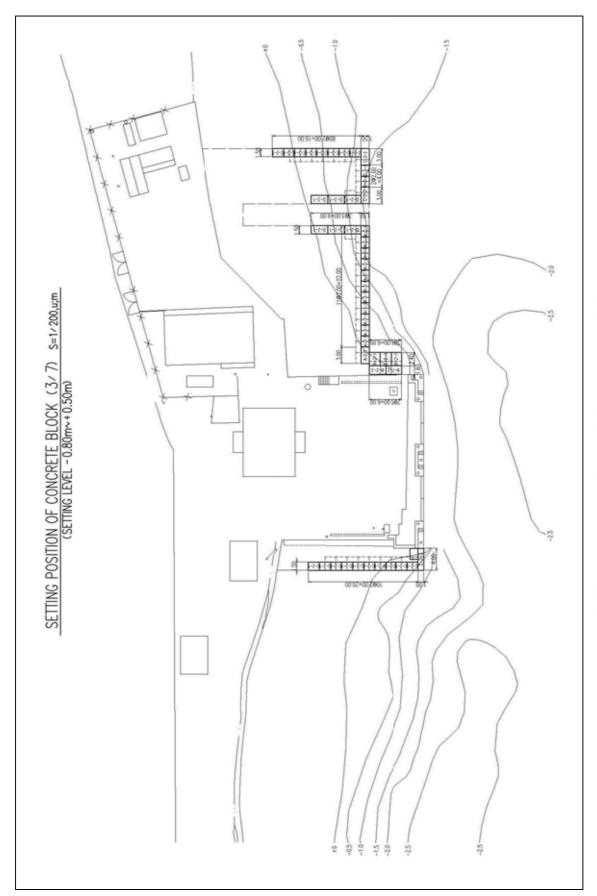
Setting Position of Concrete Block 3rd Layer
